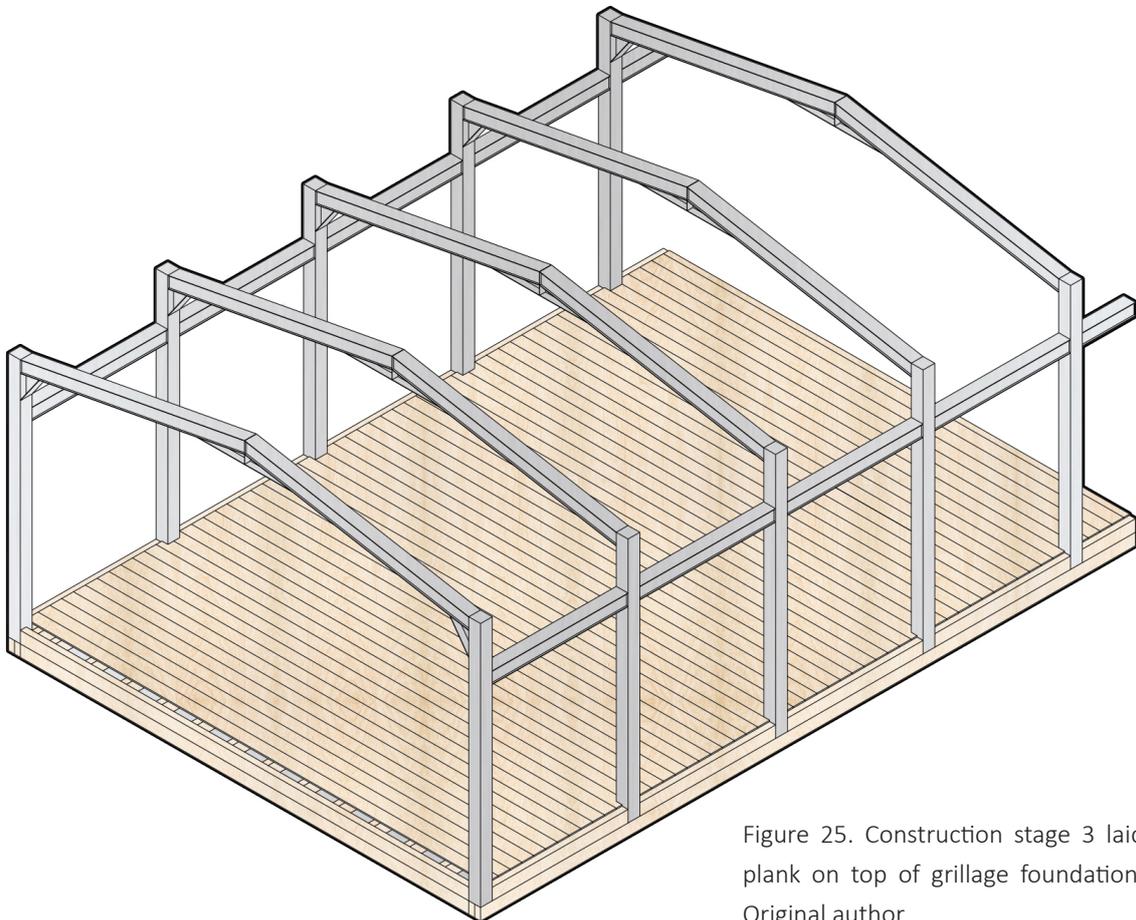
Construction stage 3 laid plank on top of grillage foundation.
